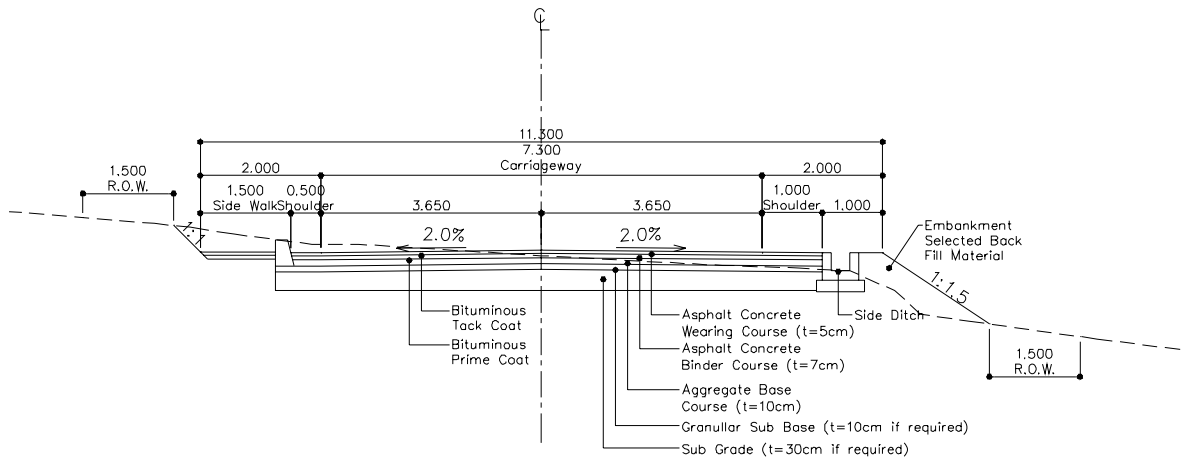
Typical Cross Section with Side Walk (Flat Type)
